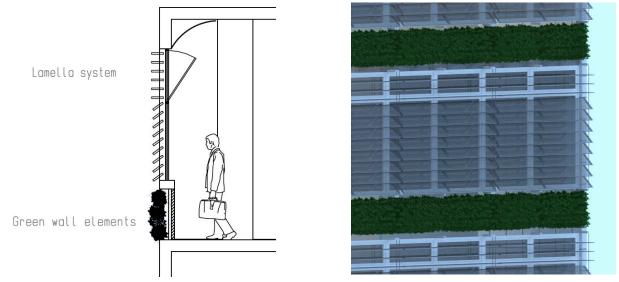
Facade construction with green elements and shading system (left: section; right: rendering)
